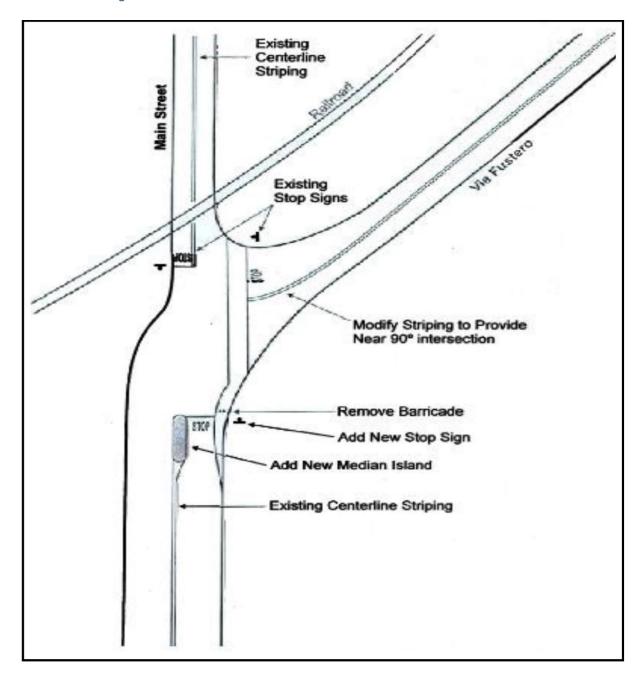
Intersection Enhancements at Main Street and Via Fustero
